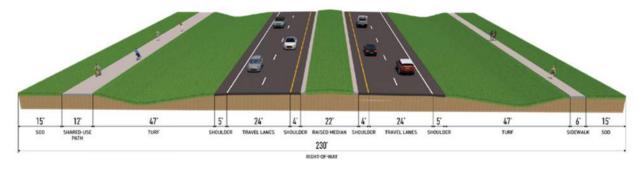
Suburban Typical Section (Segments 1, 4, and 6)
